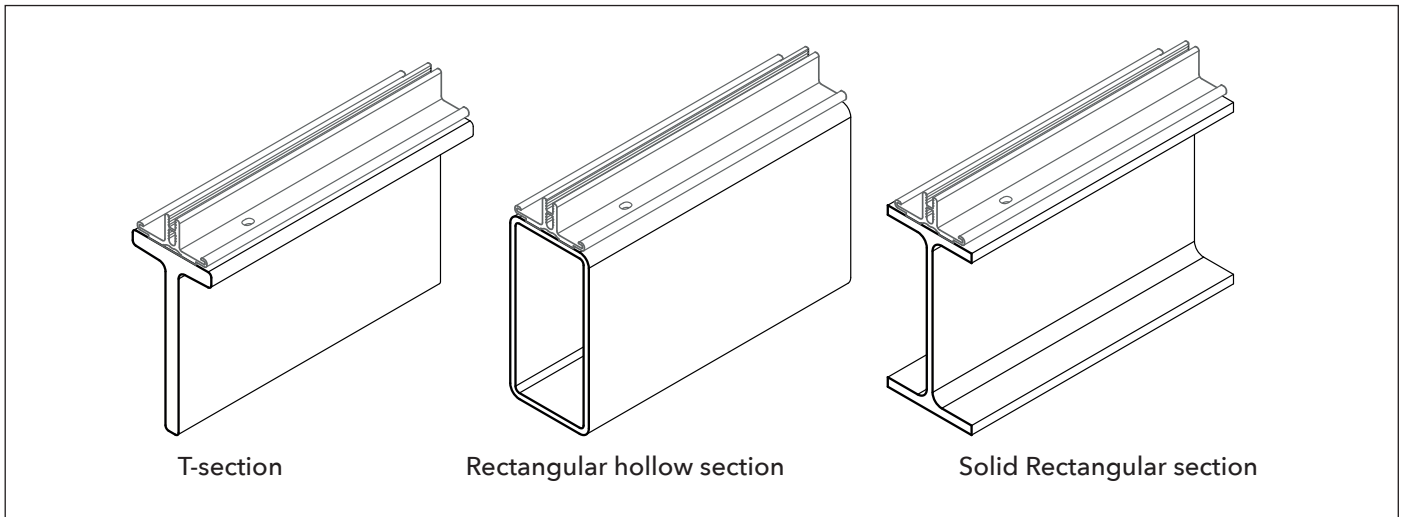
Different mullion and transom profile geometries used for curtain wall façades (STABALUX, 2025).
